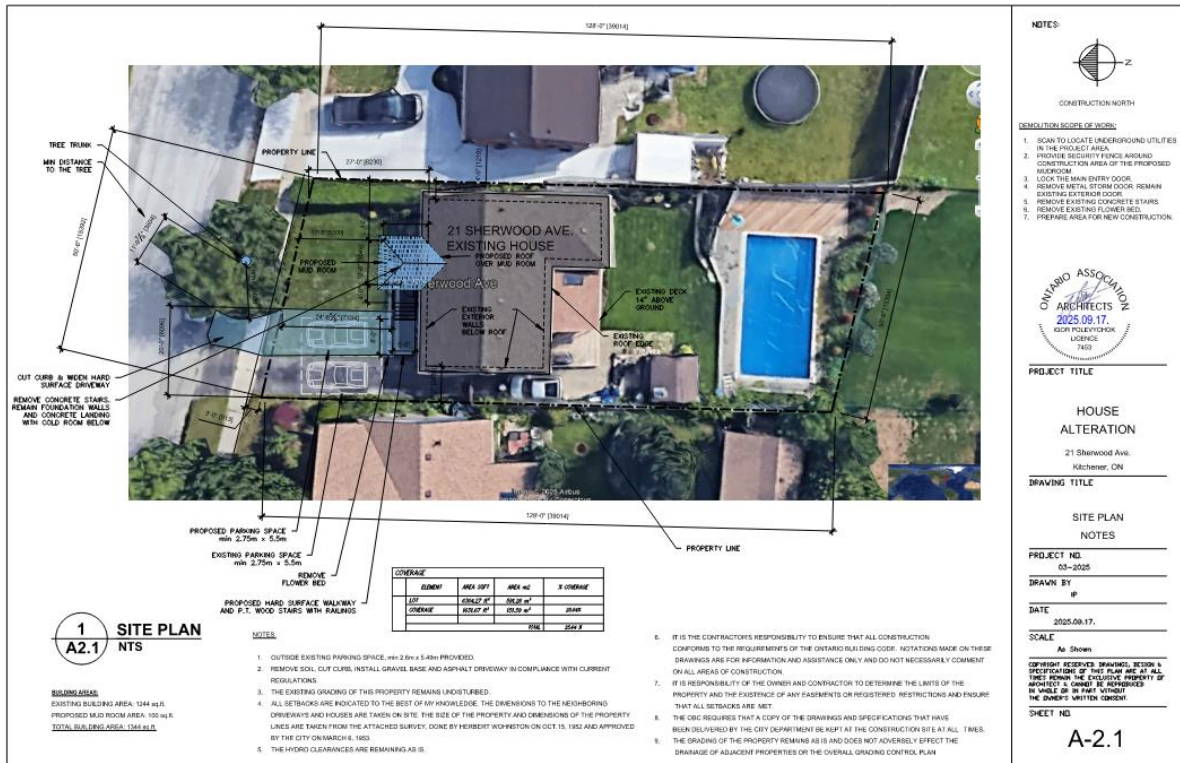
Site Plan of the Subject Property showing the location of the proposed mud room addition.
